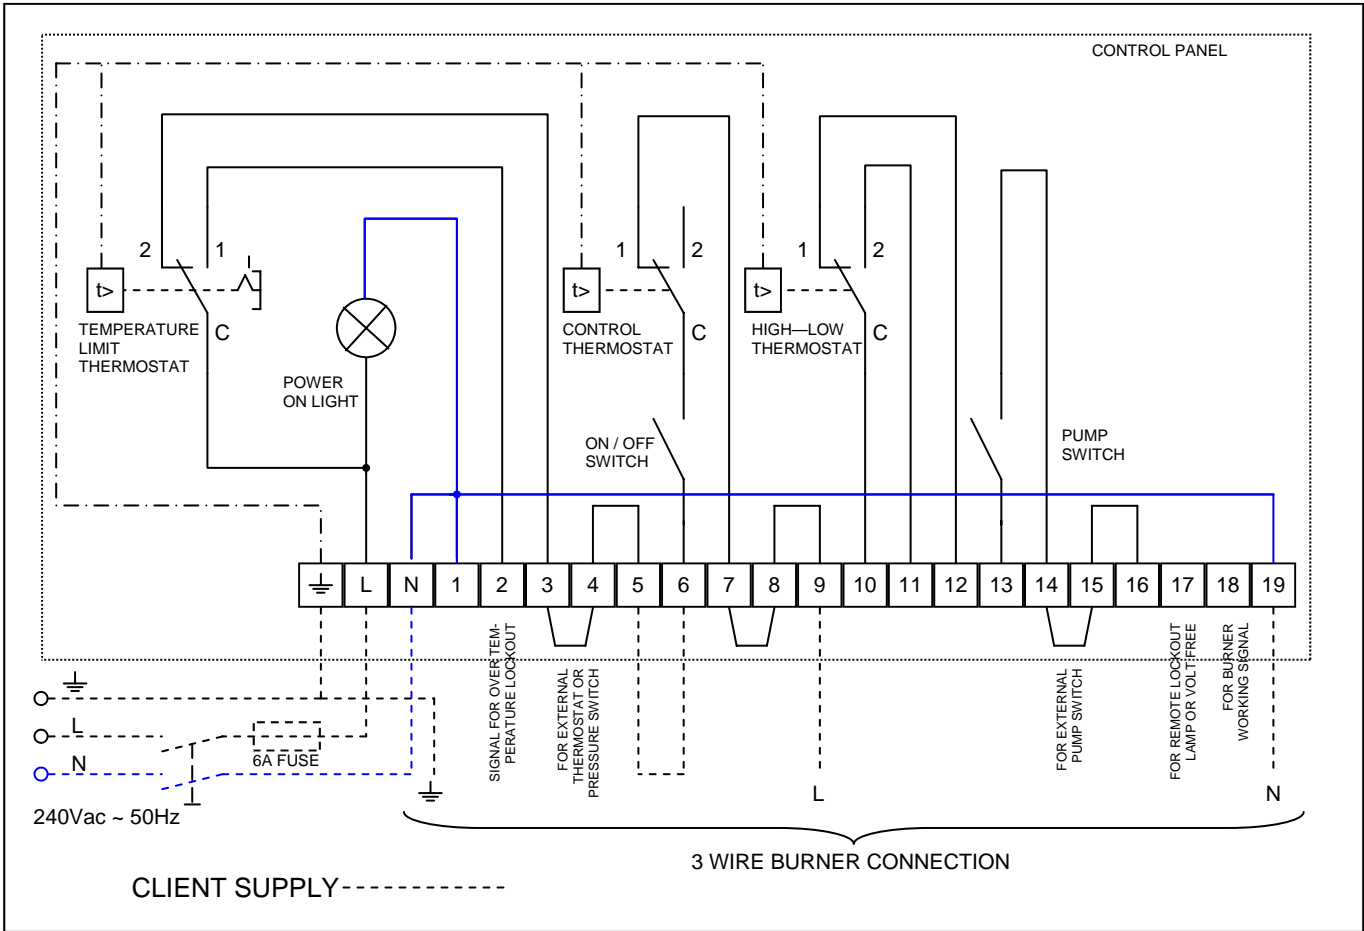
Boiler Control Panel Wiring Diagram For 3 Wire Burner Connection.
